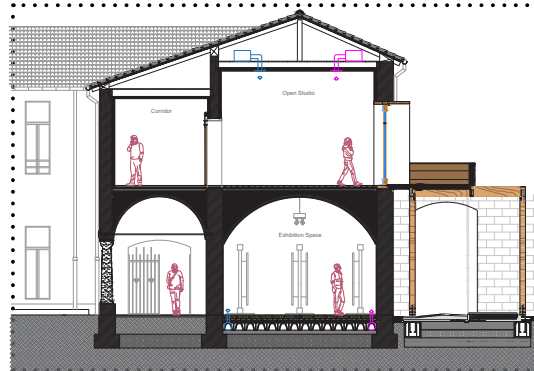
Section shows the heating and the ventilation system of the exhibition space and the meeting
